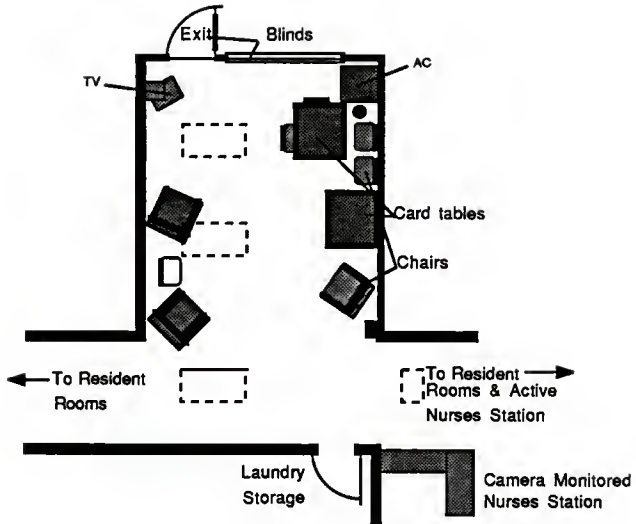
The Lower Lounge Plan. (Scale: 1/8" = 1' 0" North Δ).
